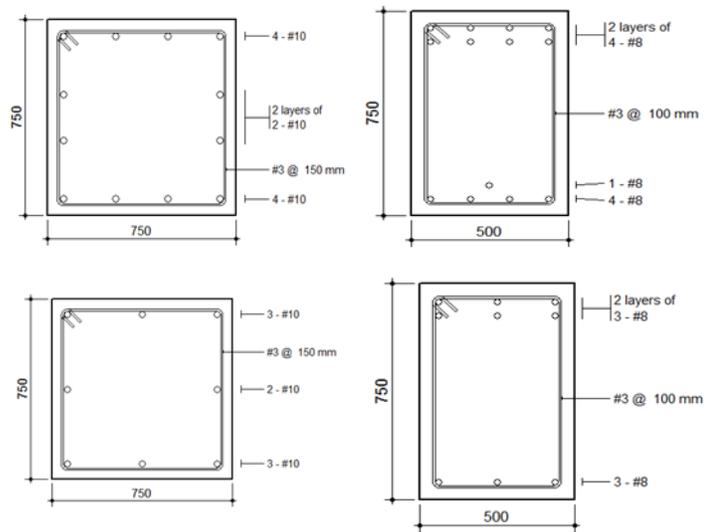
Member Cross Section and Detailing (a) Column at Ground Floor (b) Column for all the remaining floors (c) Beam for 1st to 3rd Floor (d) Beam for 4th to 6th floor
